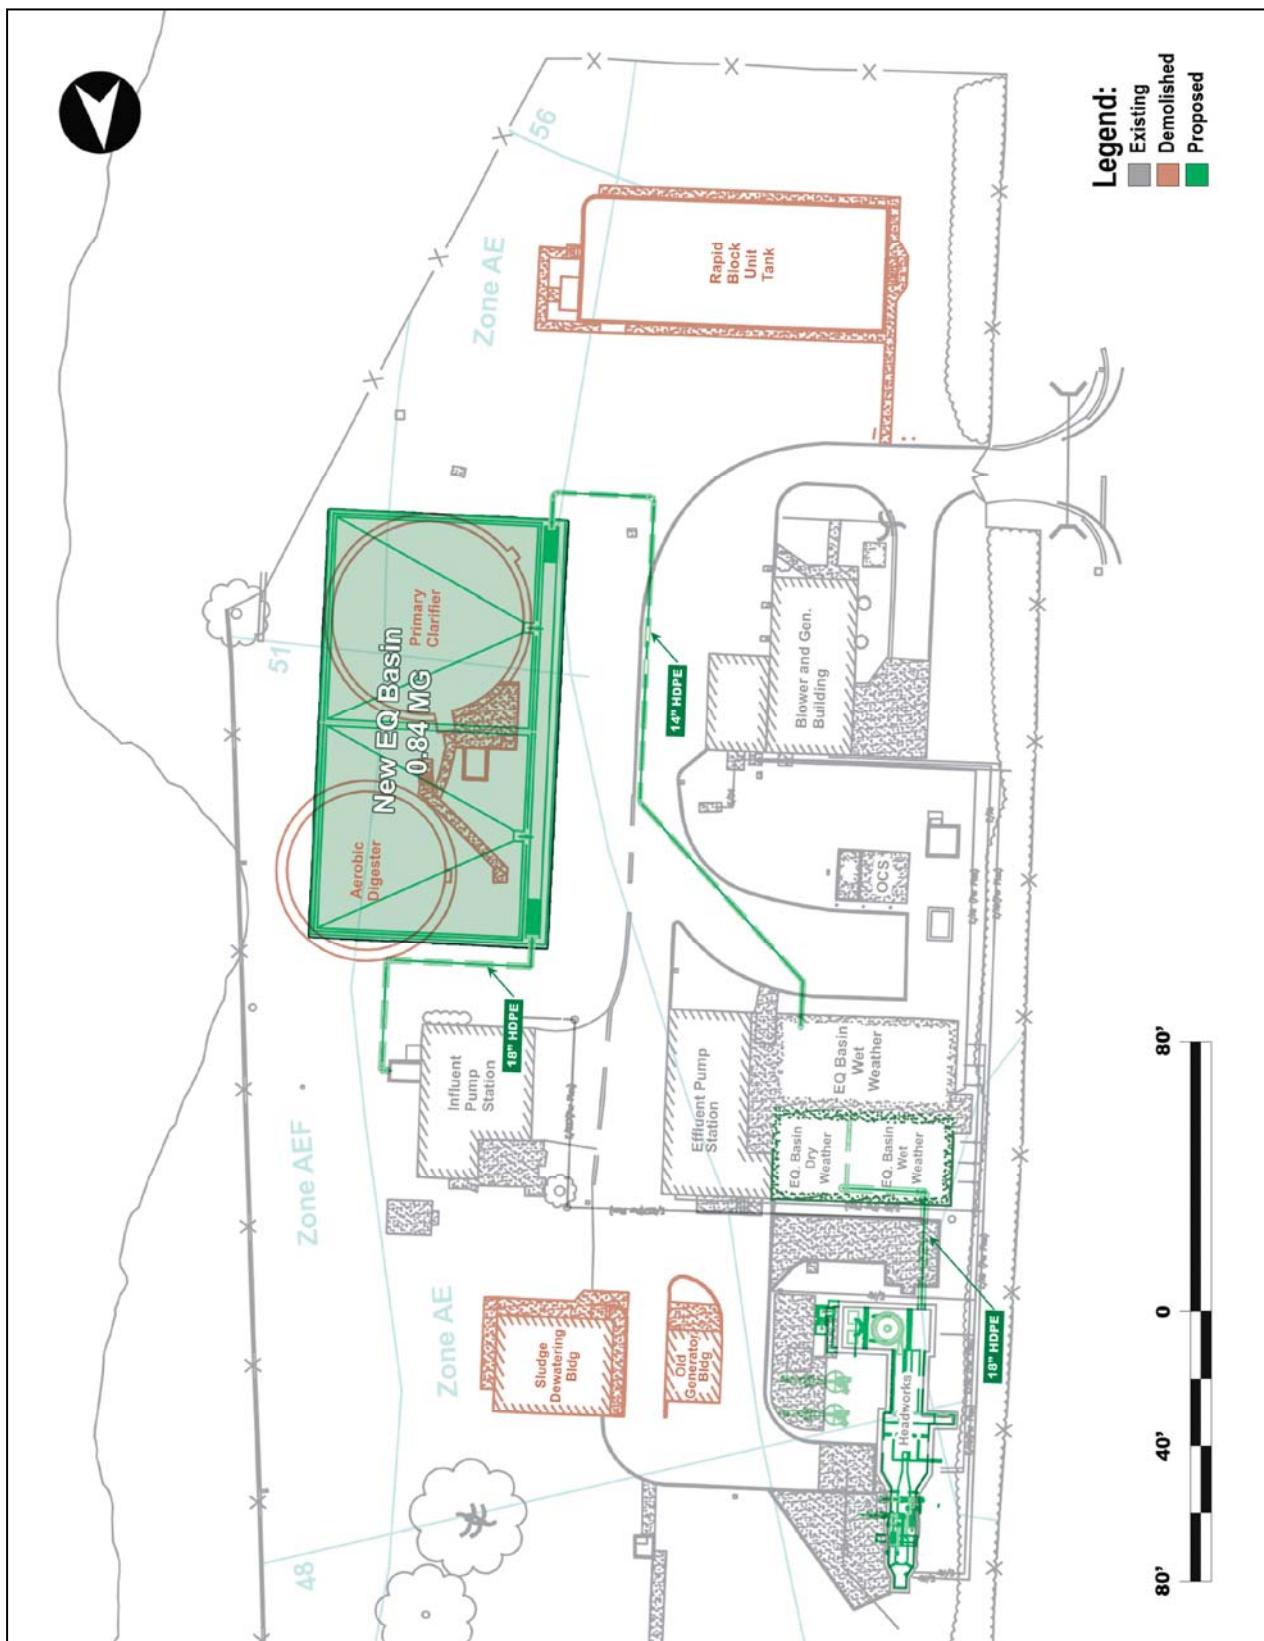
Option 3A – Site Plan at Site of Ex. Storage Tanks
